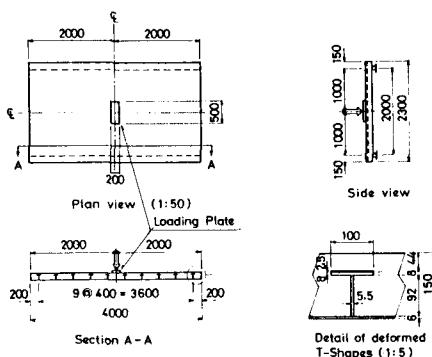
Dimensions and loading arrangement of composite slab KCB-F
